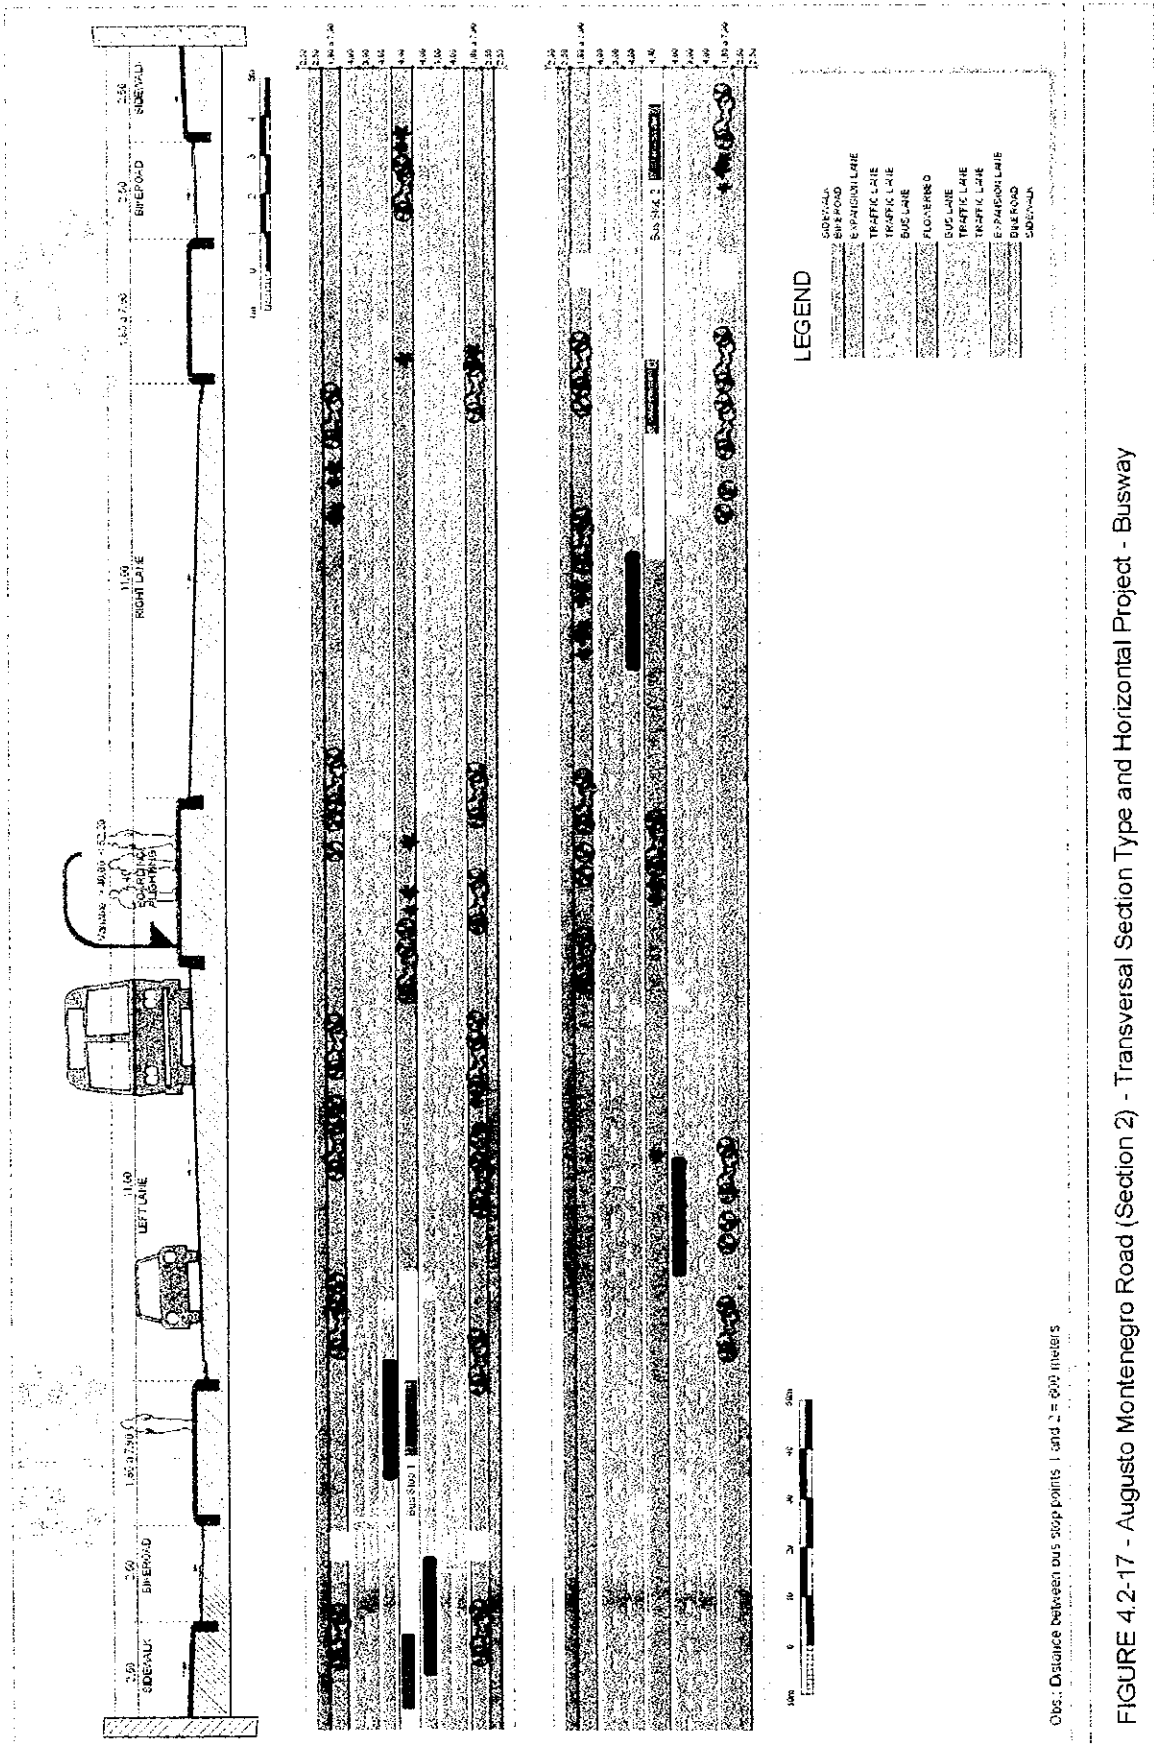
Augusto Montenegro Road (Section 2) - Transversal Section Type and Horizontal Section Type - Busway
